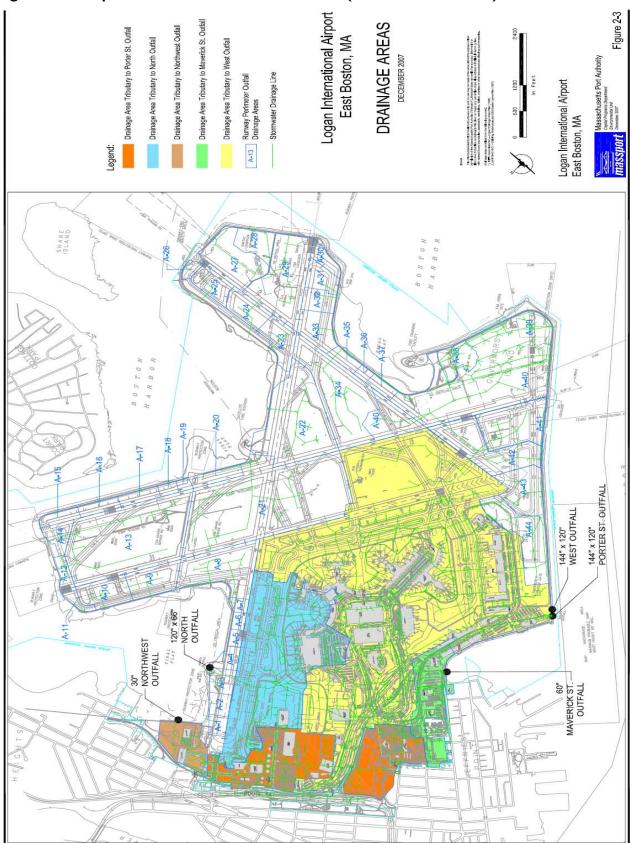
Massport Stormwater Outfall Locations (Maverick and Porter)
